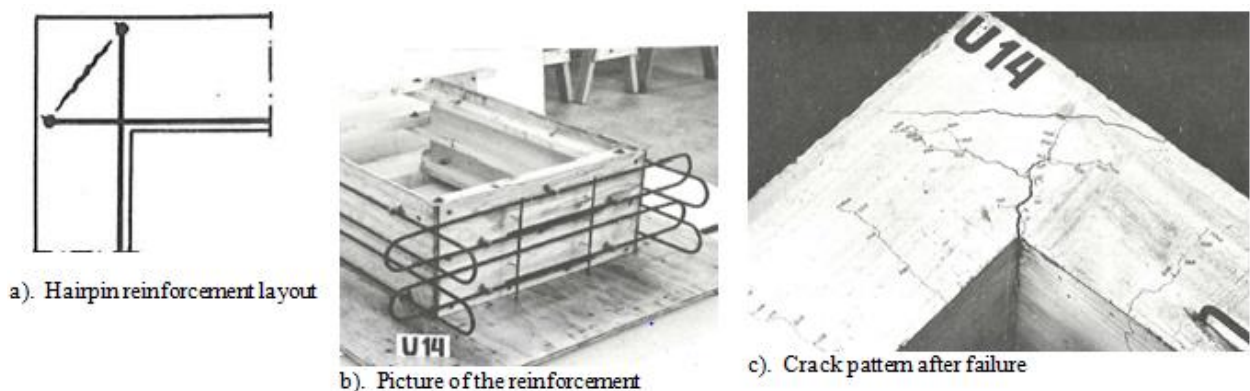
The hairpin reinforcement layout (Nilsson, 1973)
